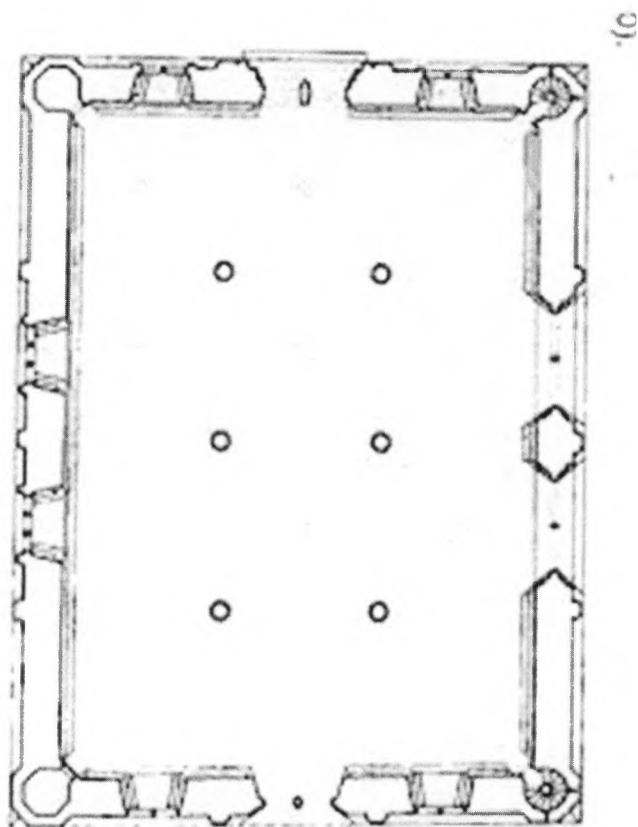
Floor Plan for Trade Hall, Llotja de Mar, Barcelona
